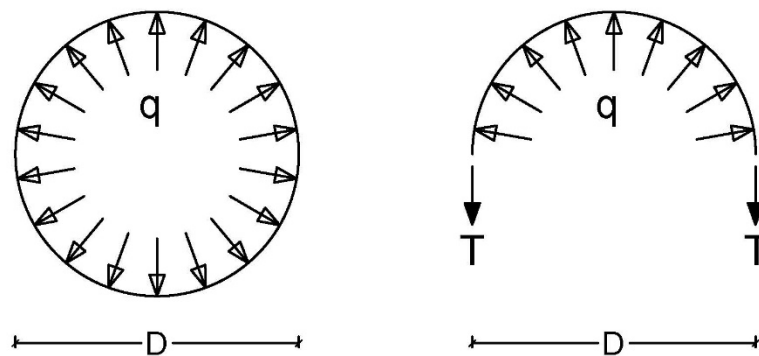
Loads at ring (horizontal section in cylindrical wall)
